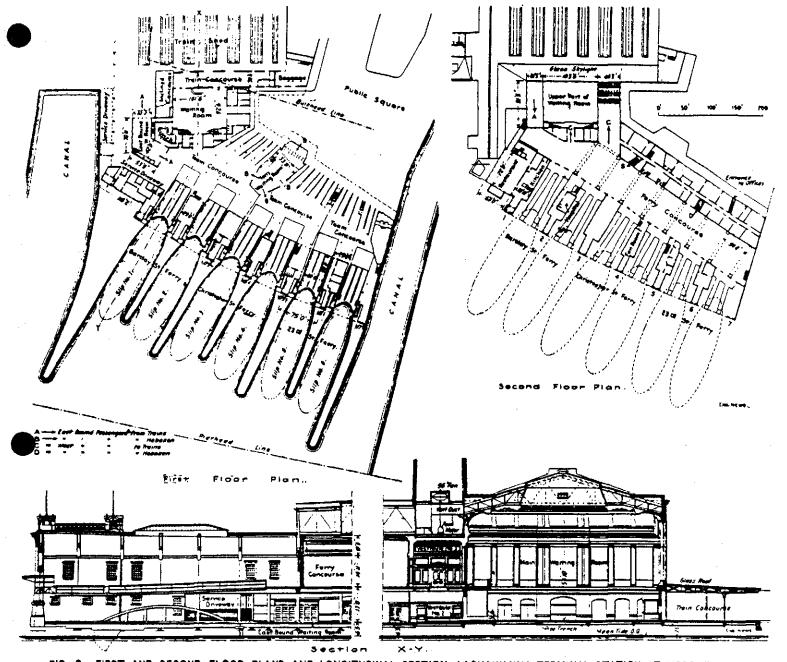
FIRST AND SECOND FLOOR PLANS, AND LONGITUDINAL SECTION; LACKAWANNA TERMINAL STATION AT HOBOKEN, N. J. (Note.—Upper Deck Landing Bridge Shown in Longitudinal Section to old type. See Fig. 13 for drawing of bridge actually used.)
